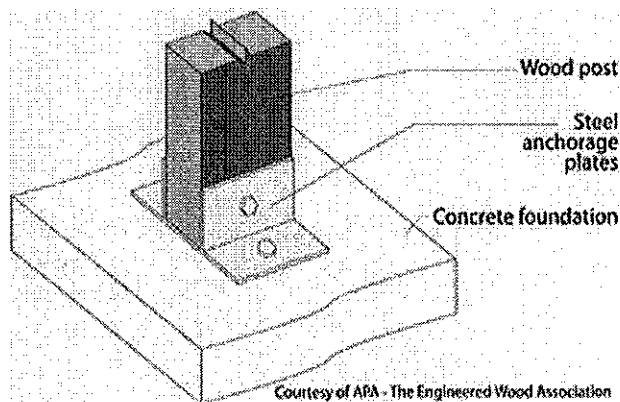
Post anchorage (post pinned) typical for glued-laminated columns
